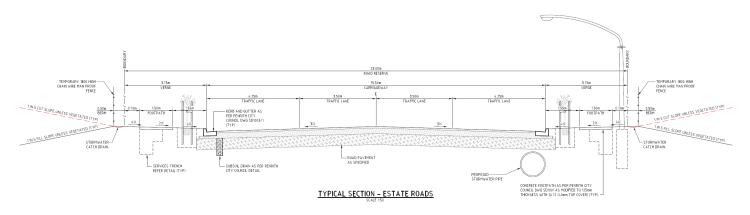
Typical Estate Road Section for Roads No. 1 and No.2
